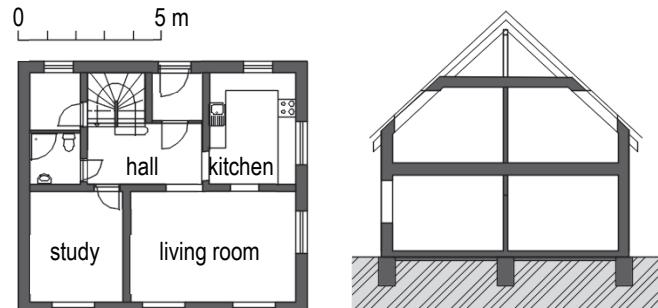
The studied single-family house. Left - first floor plan. Right - cross section.
